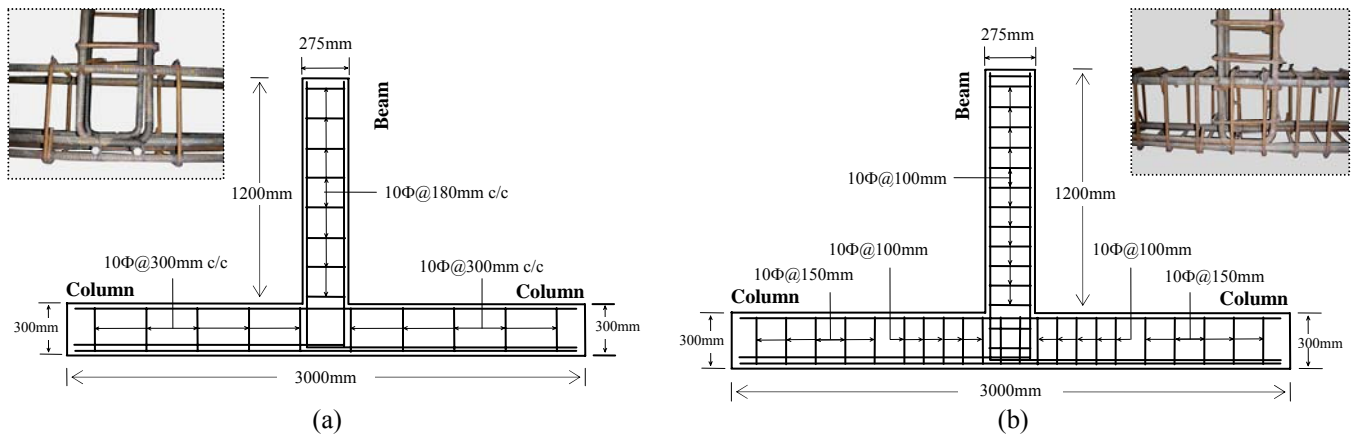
Reinforcement detailing of (a)Unconfined and (b) Specially Confined Beam-Column Joint
